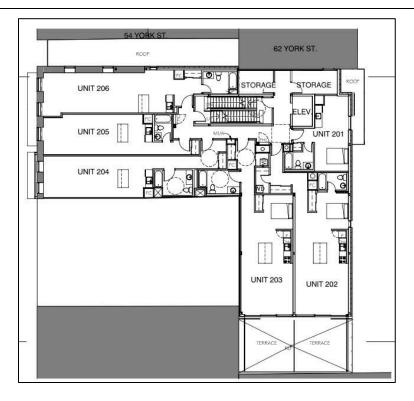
Exhibit D: Second Floor Plan of the Proposed Redevelopment.
